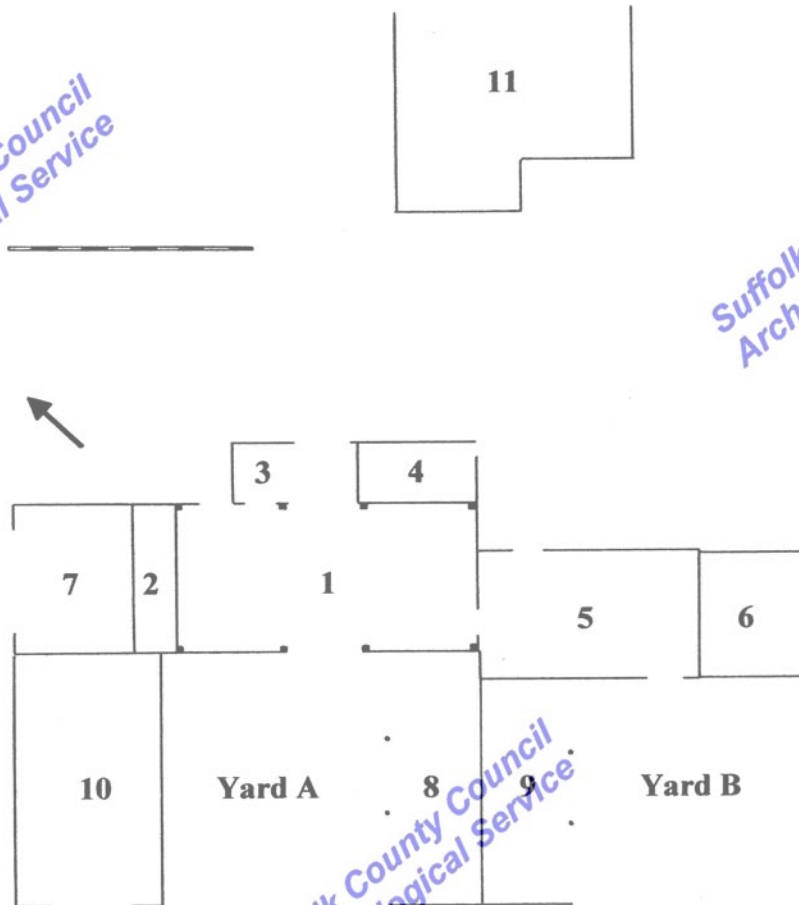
Block Plan of Site (showing the original extent of the barn with reference to its various surviving extensions and additions). Scale in metres.
